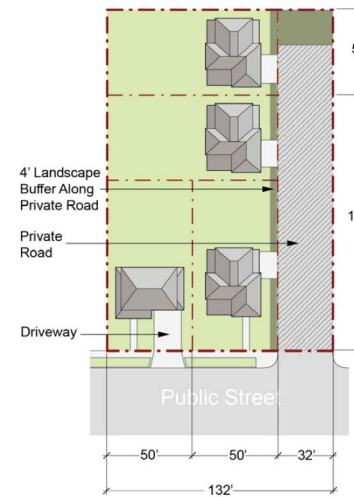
Subdivided parcels oriented towards the public right-of-way, and parcels oriented towards a private road.
